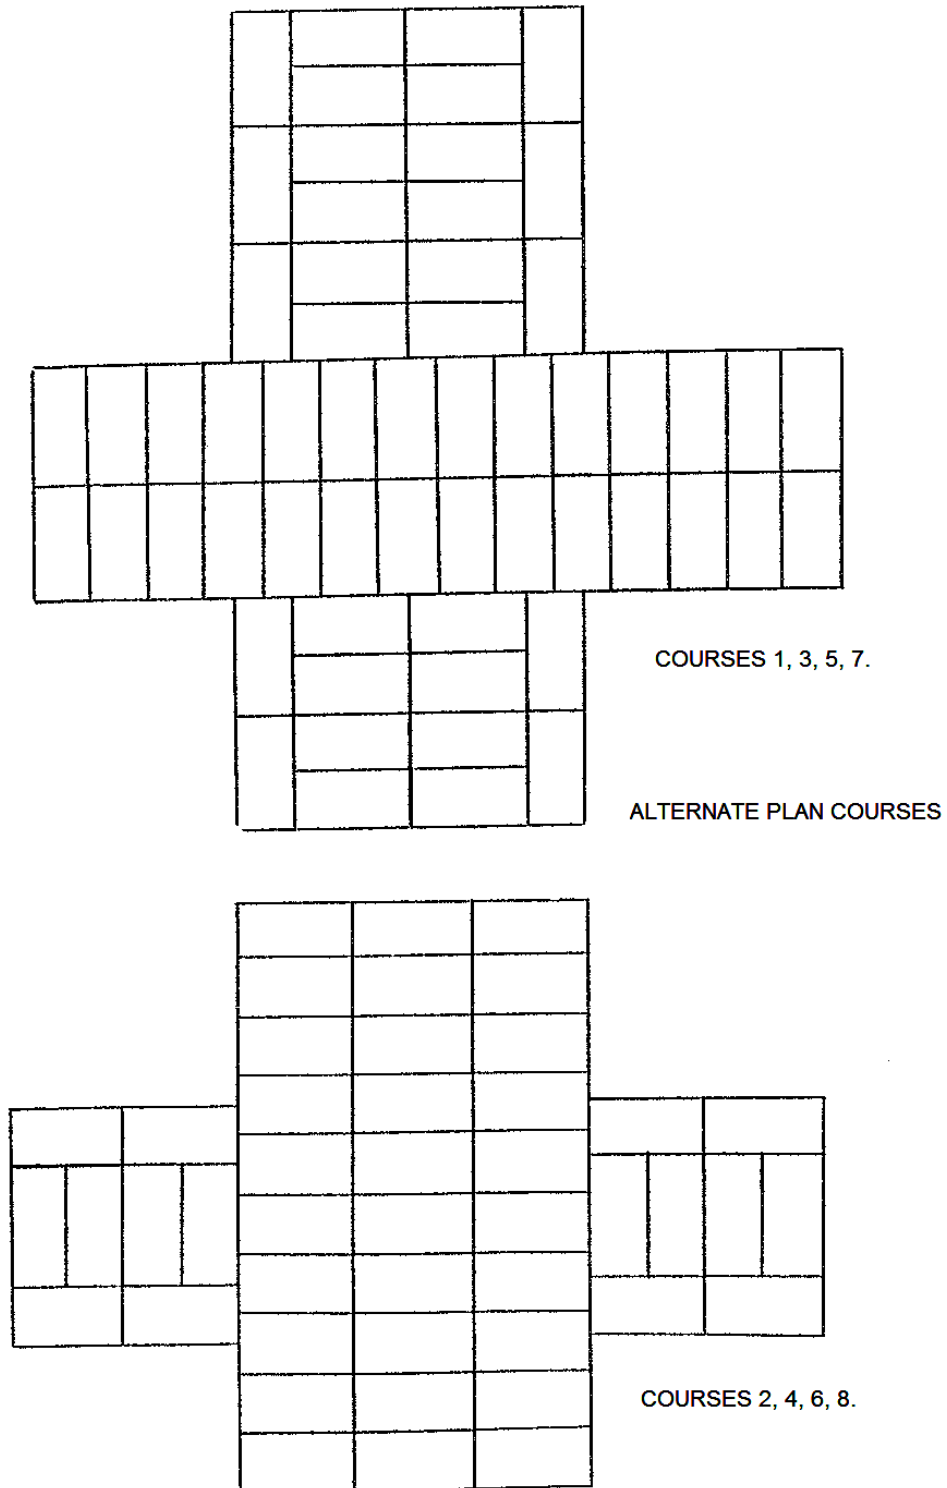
Crossed junction between three brick main wall, and a two brick wall
